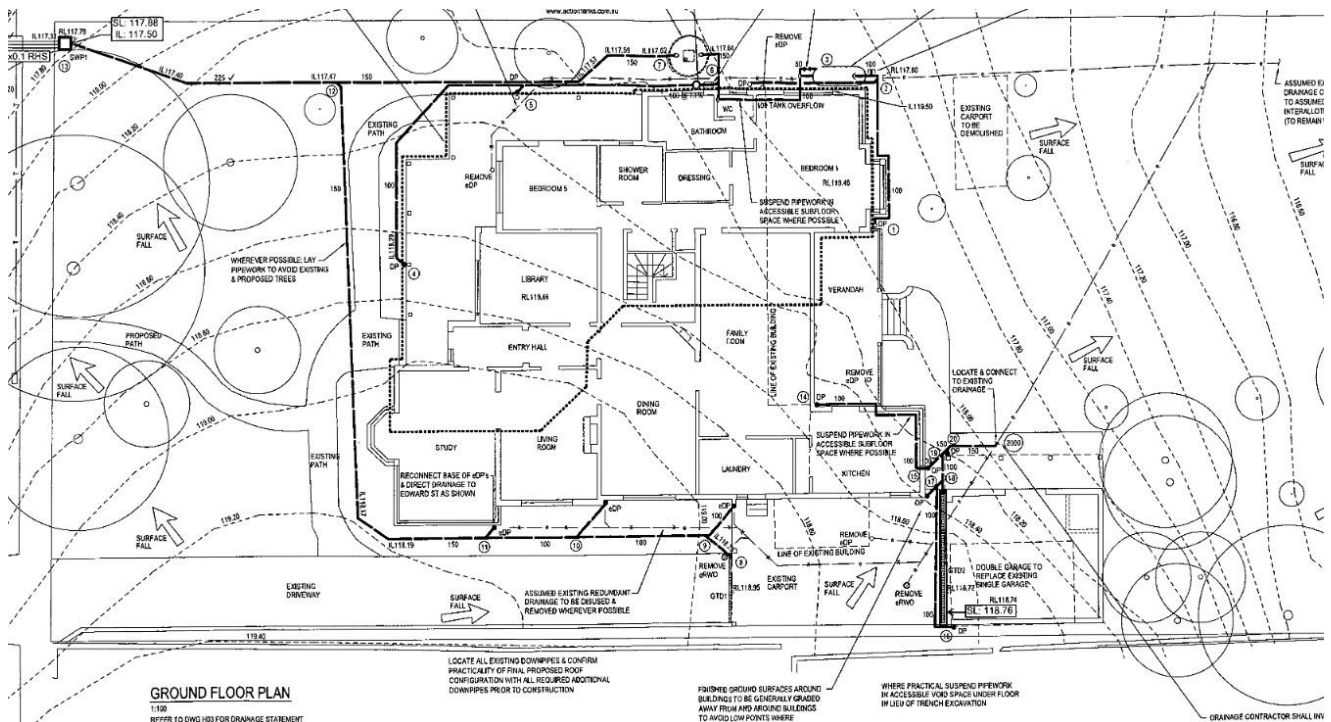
Ground floor plans of 1 Edward Street, Gordon.
